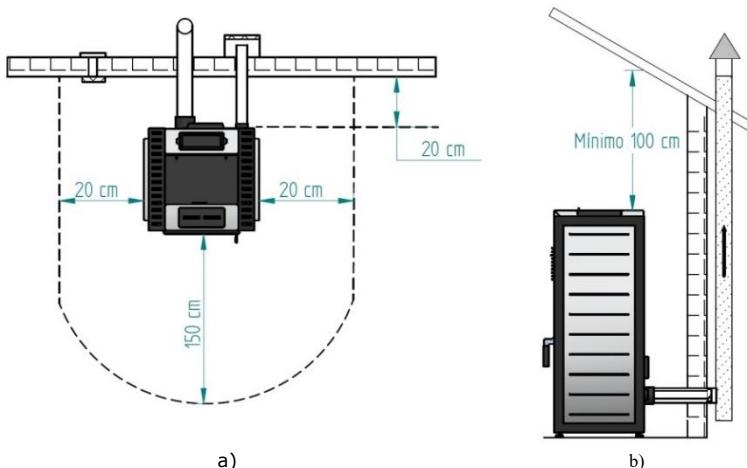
Minimum distances from all surfaces: a) upper view of the unit's installation; b) side view of the unit's installation
